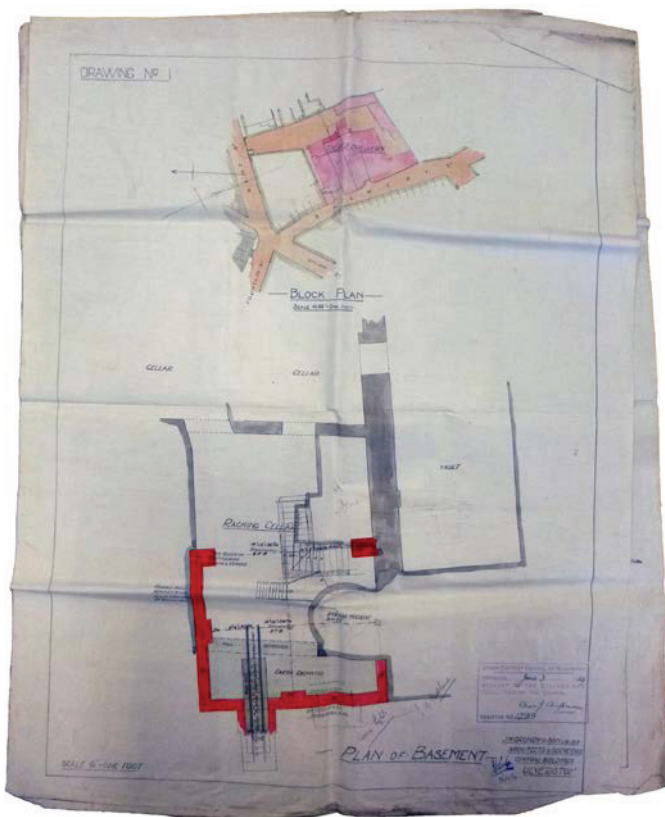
(left): Drawing number 1: block plan and basement plan; proposed additions to Old Brewery, 1919
